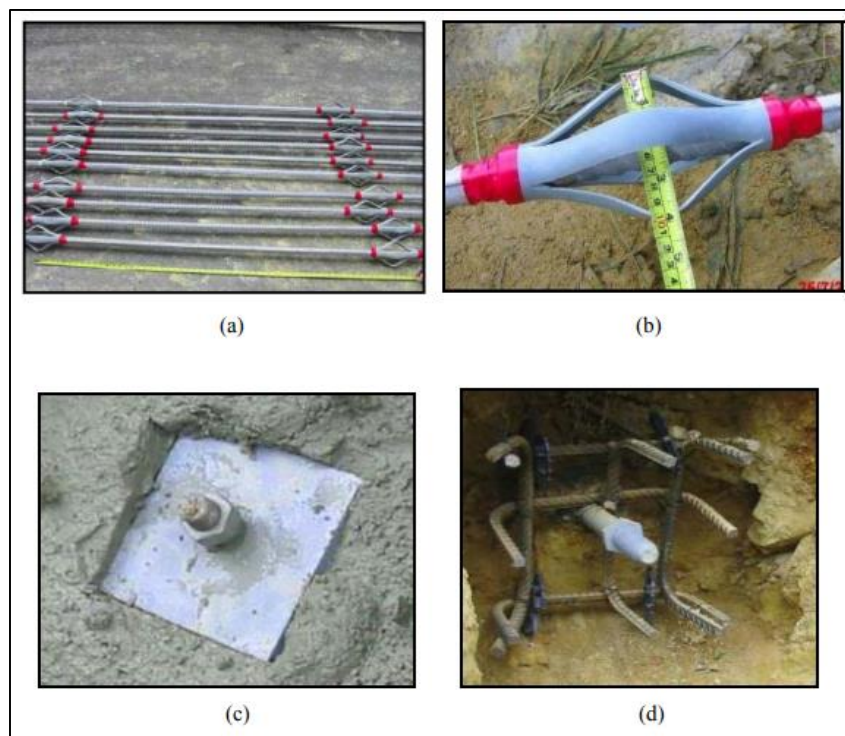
Various elements of soil nailing (Yeung, 2008), a. Soil nail reinforcement Bars, b.
